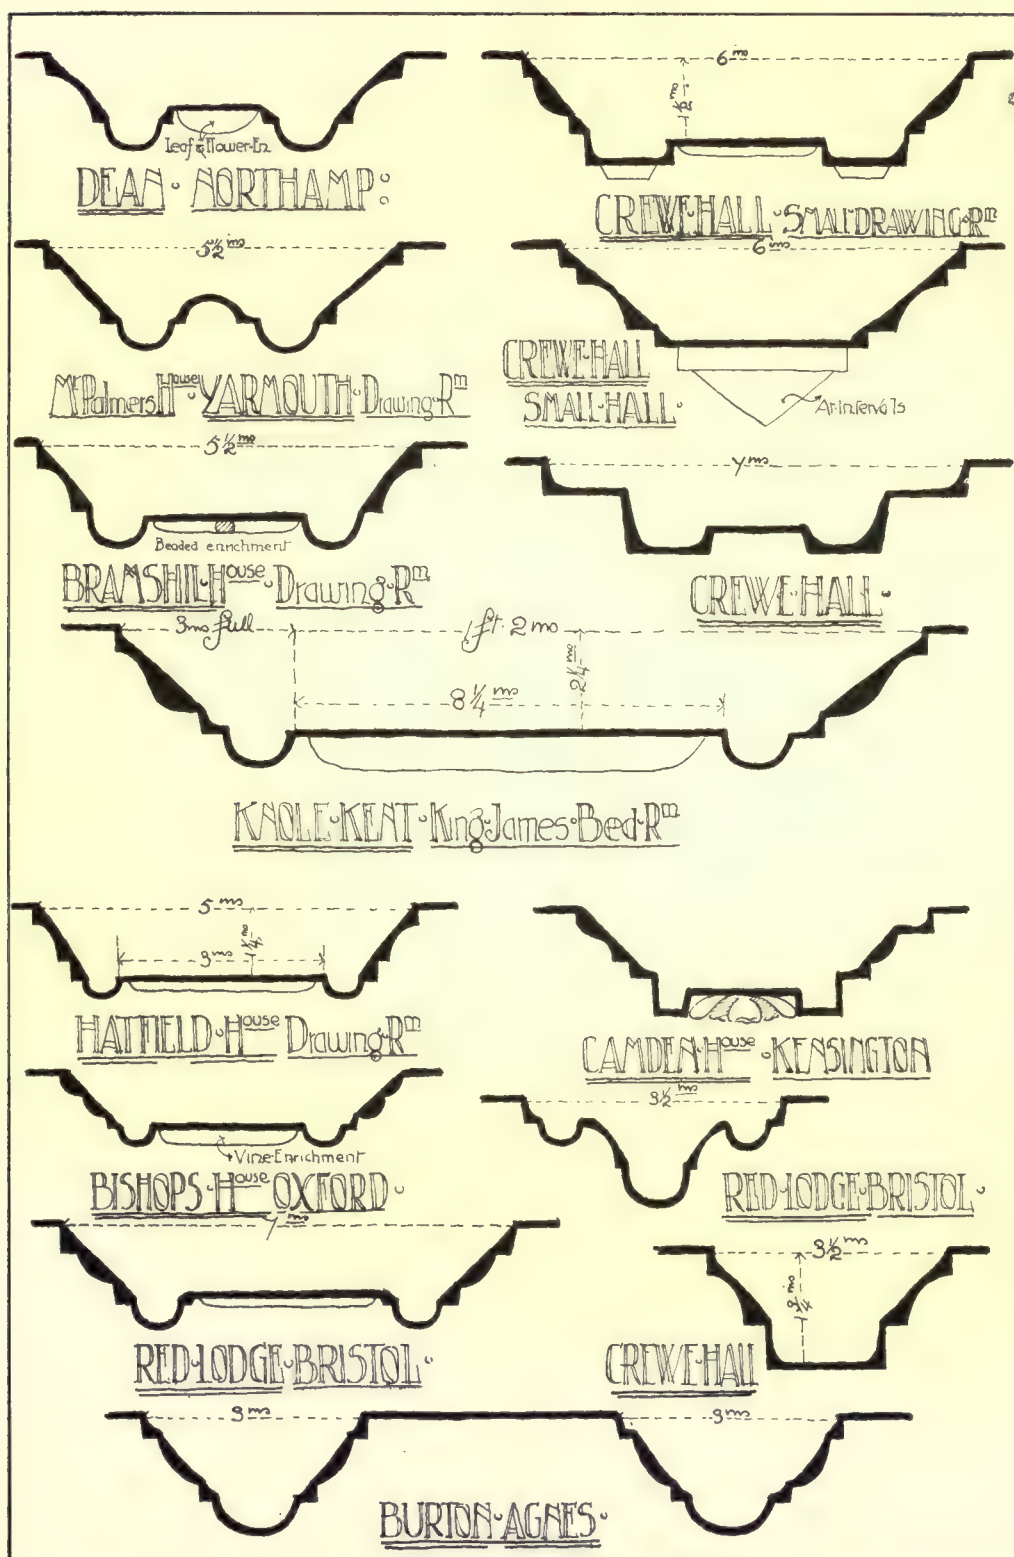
SECTIONS OF MOULDED CEILING RIBS.
